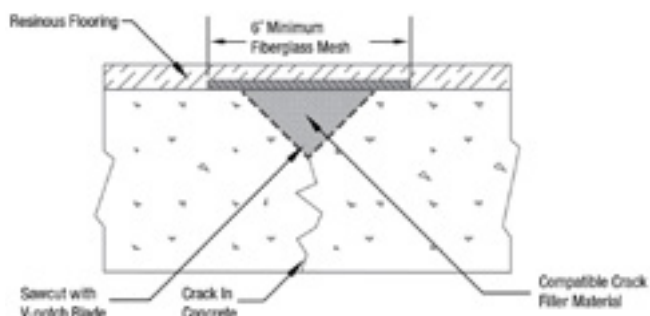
When repairing static cracks on elevated slabs, installers often reinforce the joint with a 6-inch-wide strip of fiberglass mesh. The added reinforcement increases tensile strength and helps limit movement between the concrete and the flooring above..
